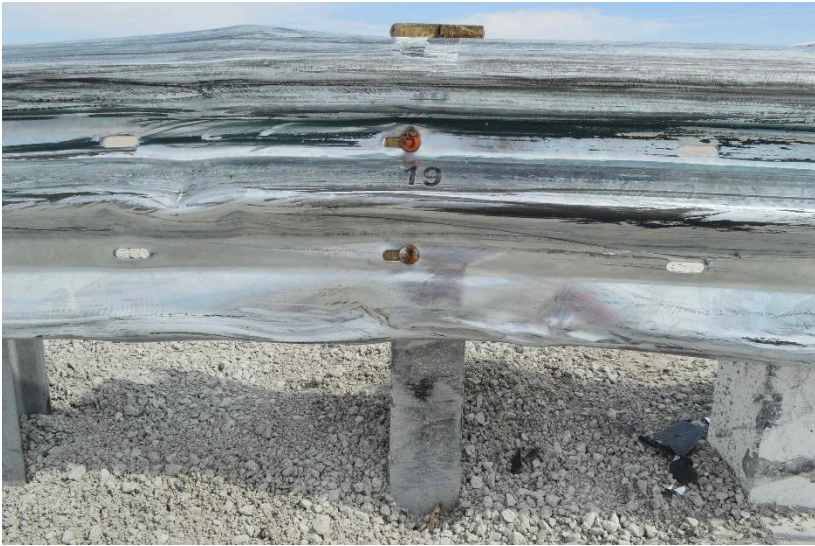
System Damage, Post No. 19 and Rail Connection Terminal, Test No. 34AGT-1
